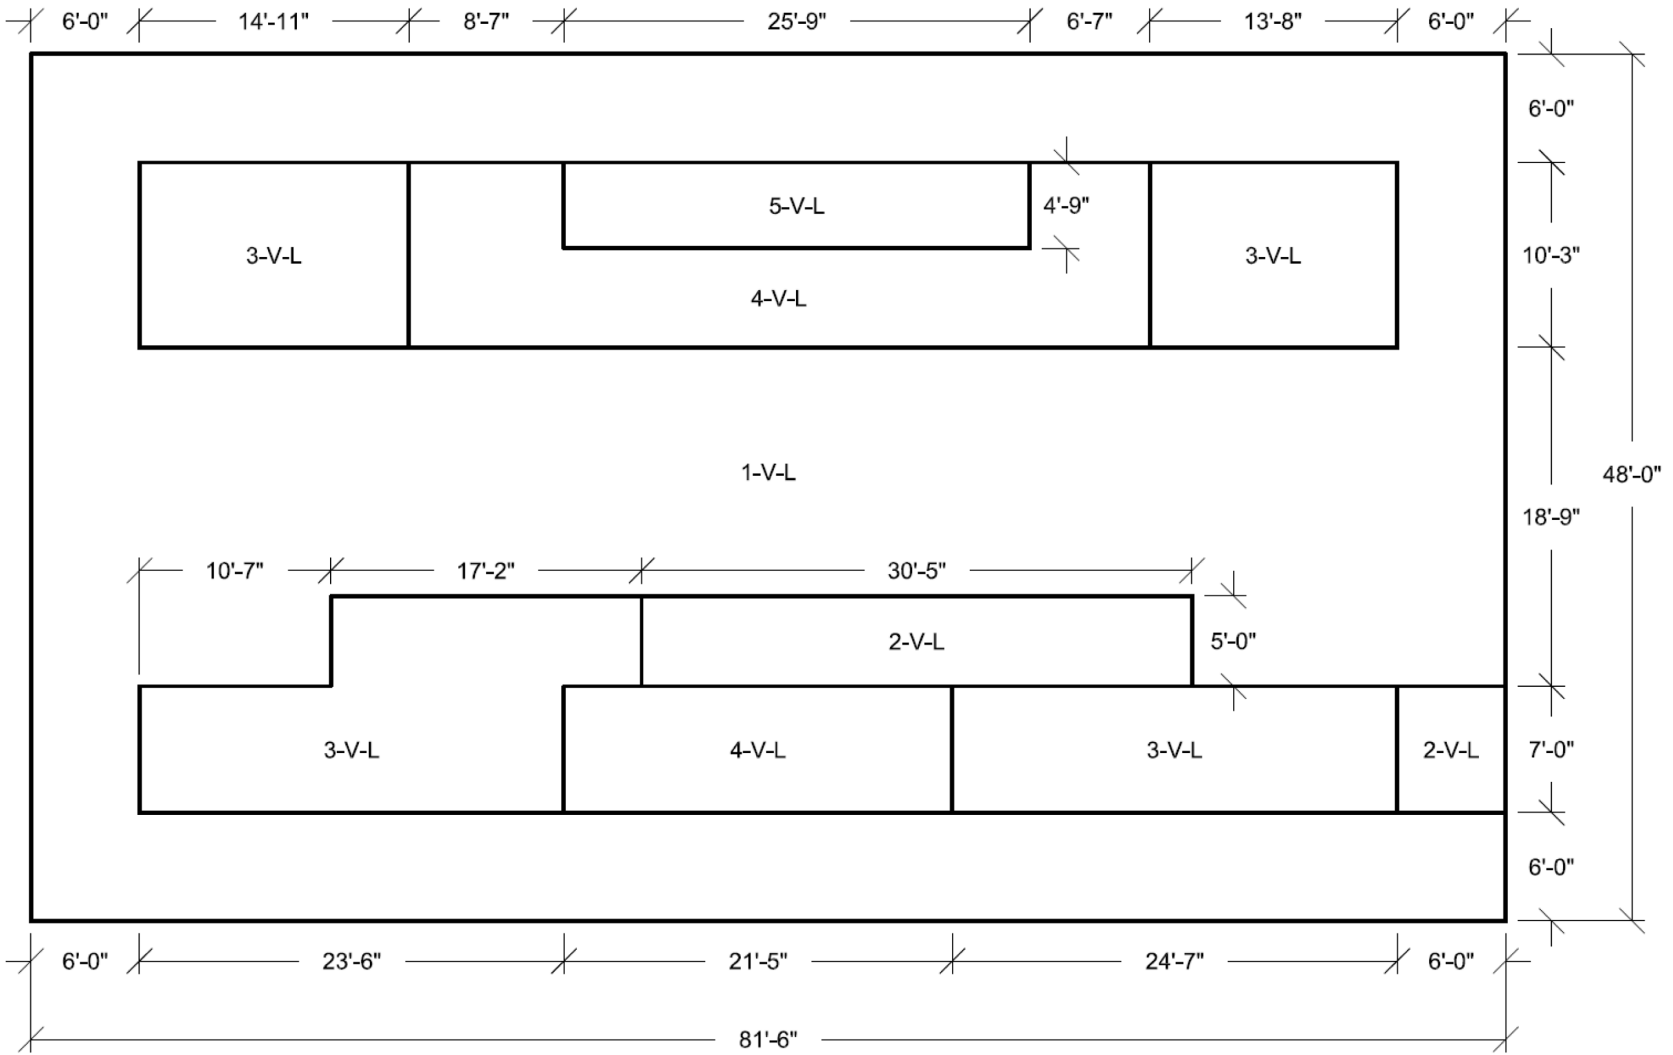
H.6-145 DGFO SV Slab 1 Looking Down Vertical Reinforcement Zones Far Side Face
